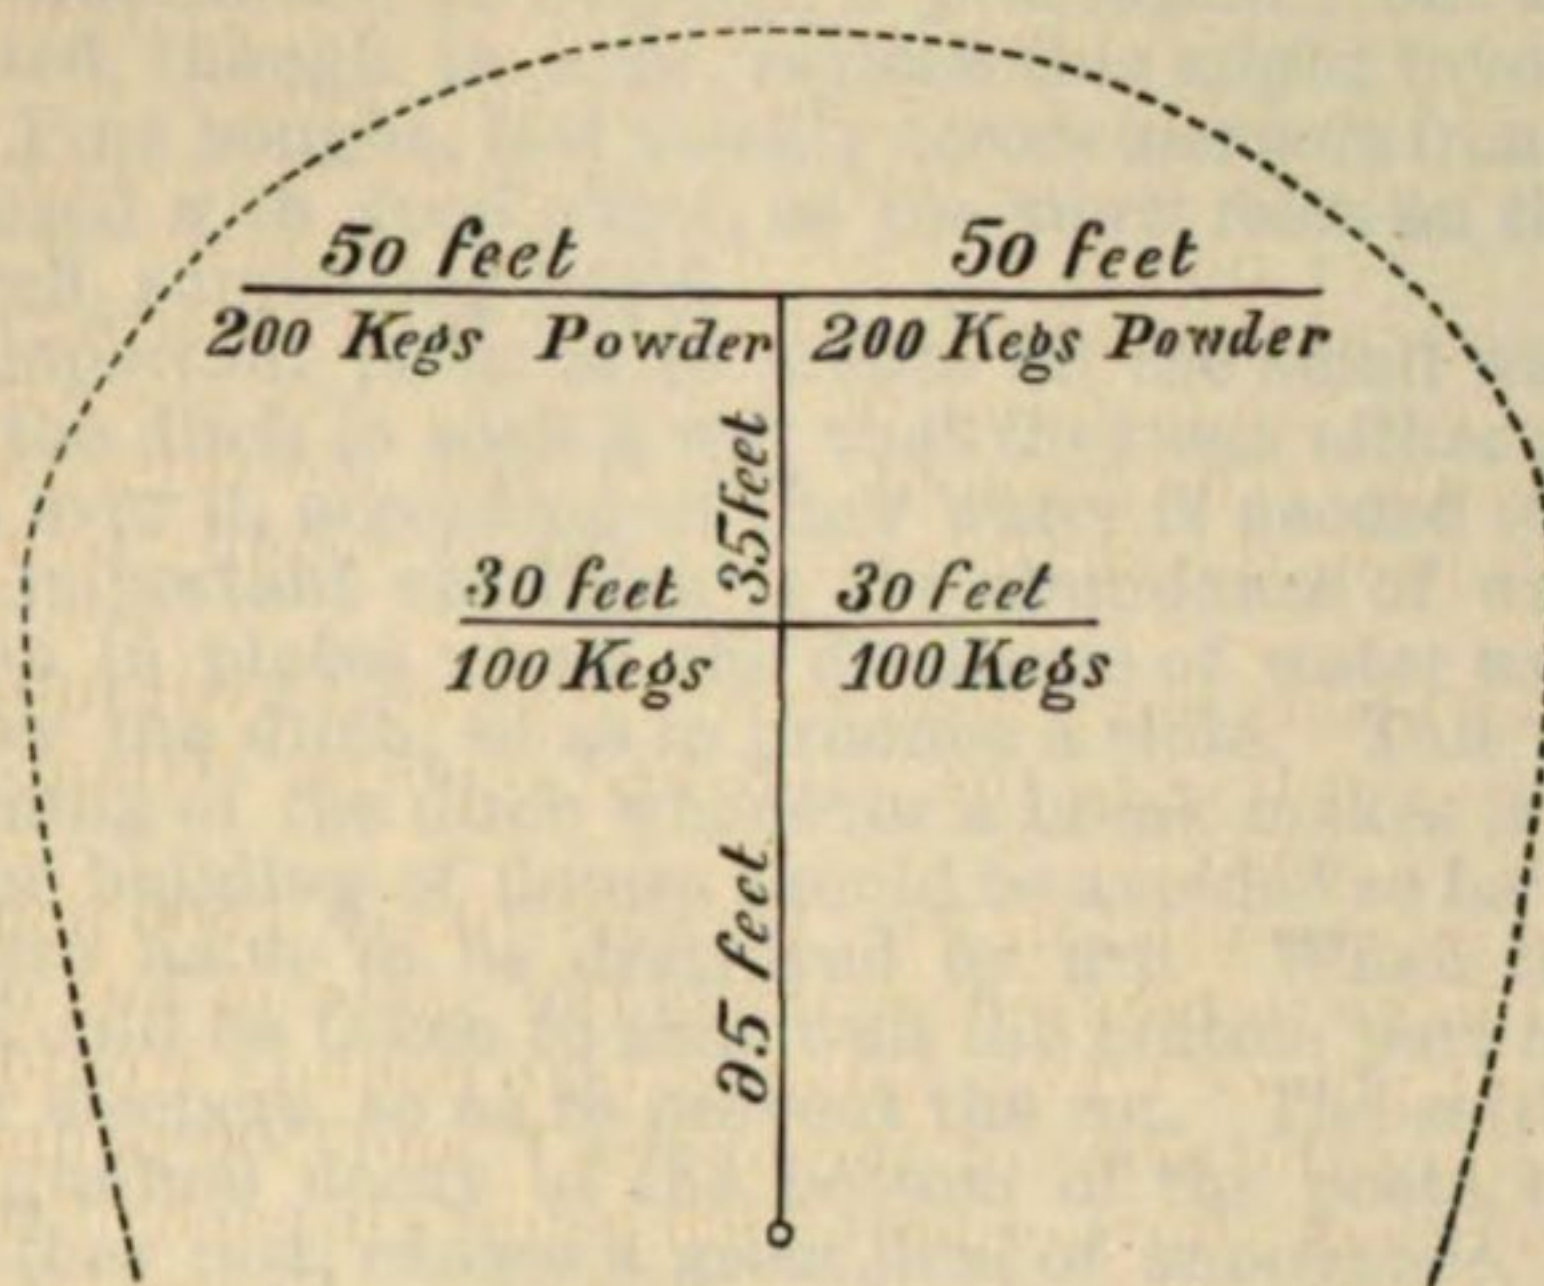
Ground-plan of heavy blast. (See pp. 404, 405, 406.)
